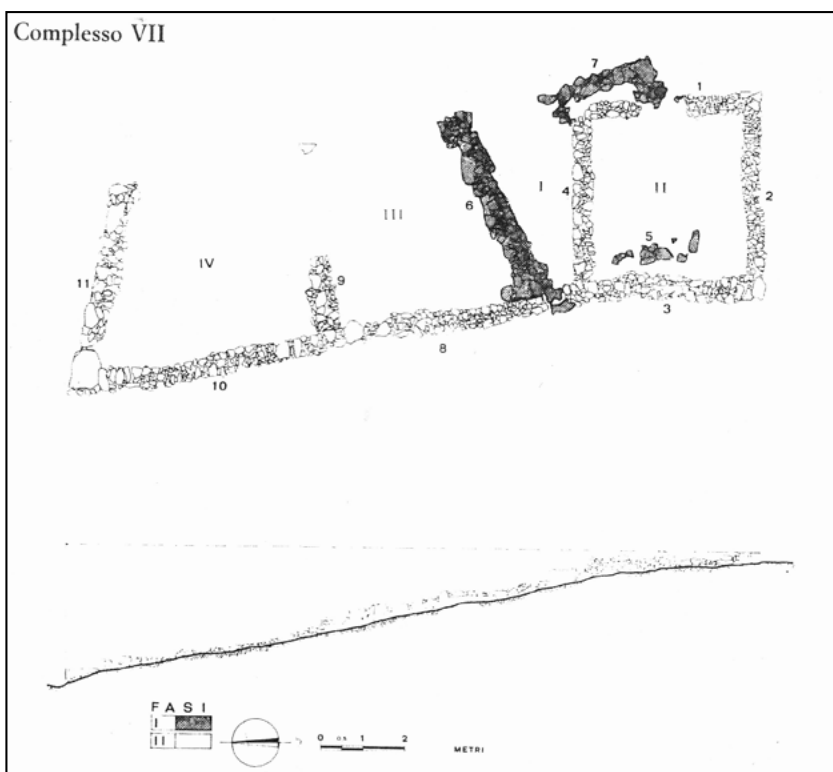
PLAN AND SECTION OF COMPLEX VII FROM LAGO DELL'ACCESA AREA A (CAMPORALE 1985: 155).
